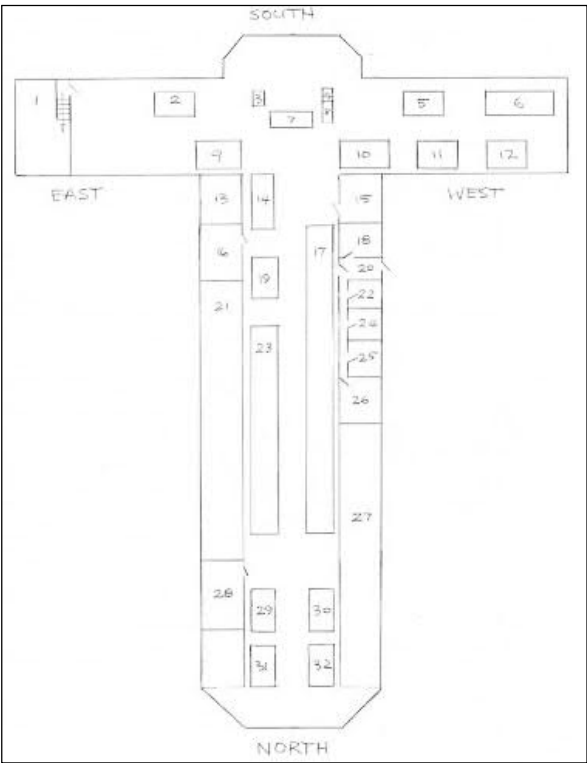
; Unproven sketch floor plan of 1950s transmitter buildings
